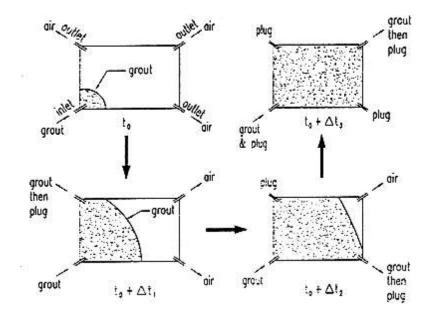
Stages for Grouting of Bedding Layer [2.20]
